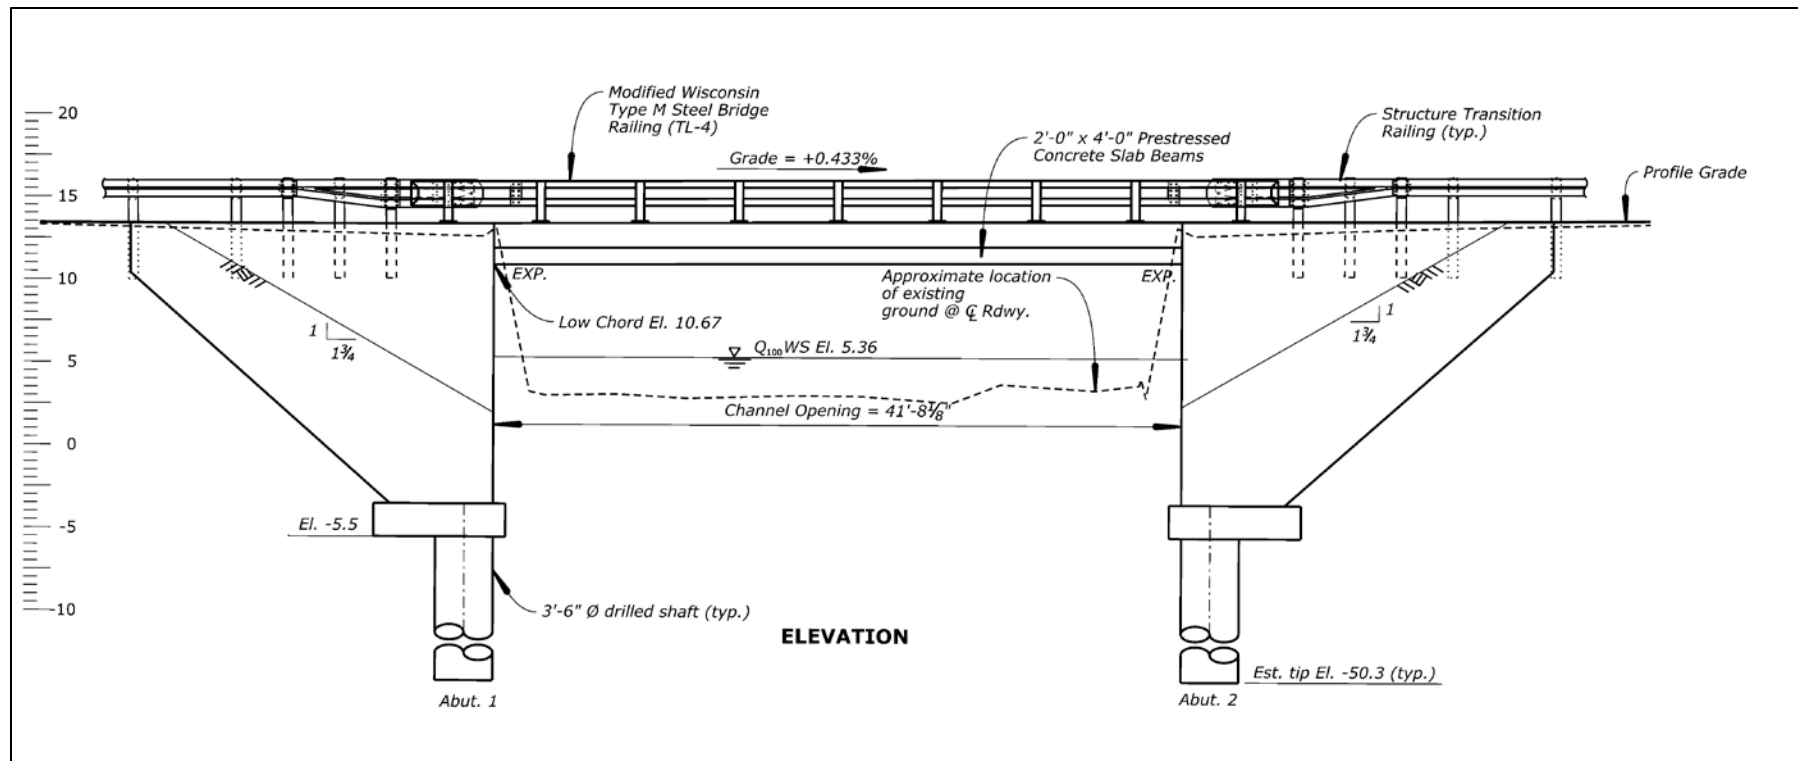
Proposed Preliminary Design of Bridge 1, Elevation View
